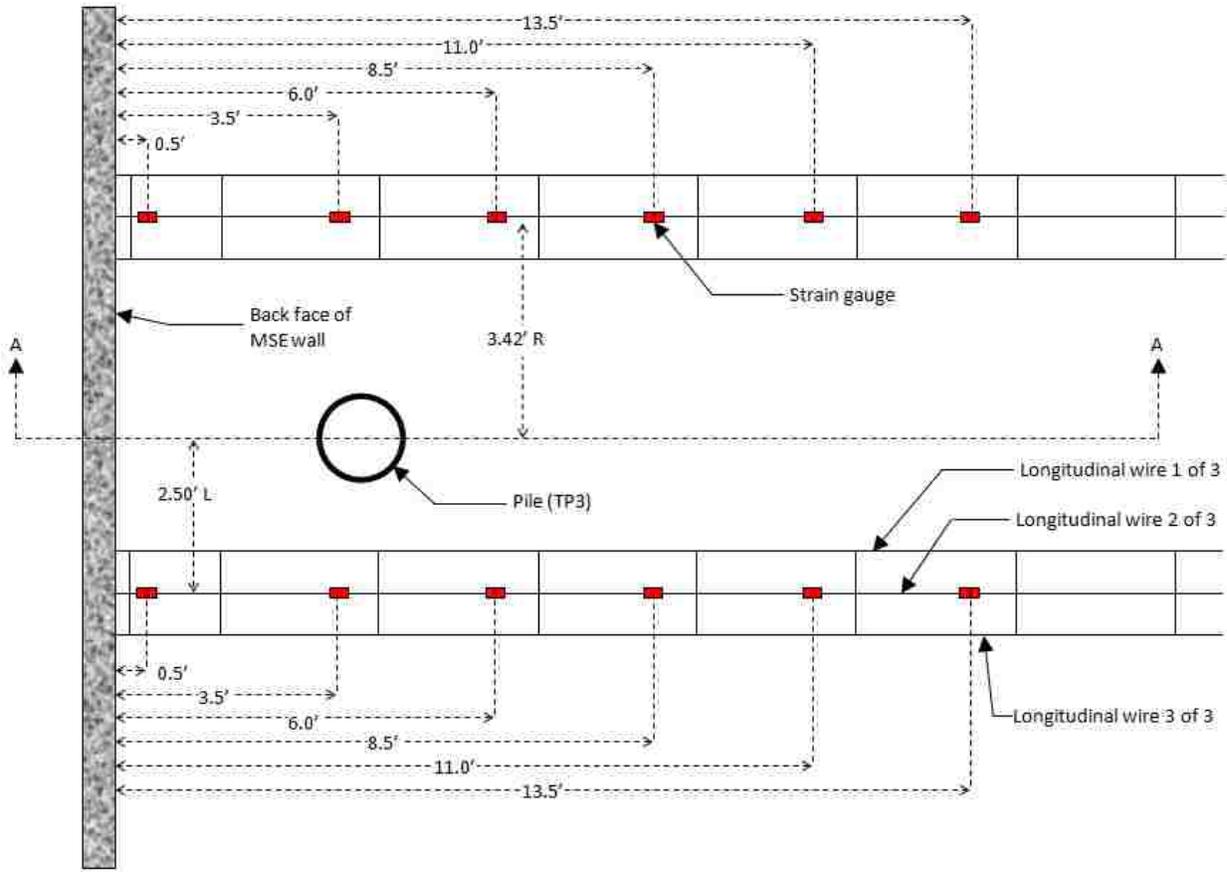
Plan view of top layer of reinforcement at TP3.
